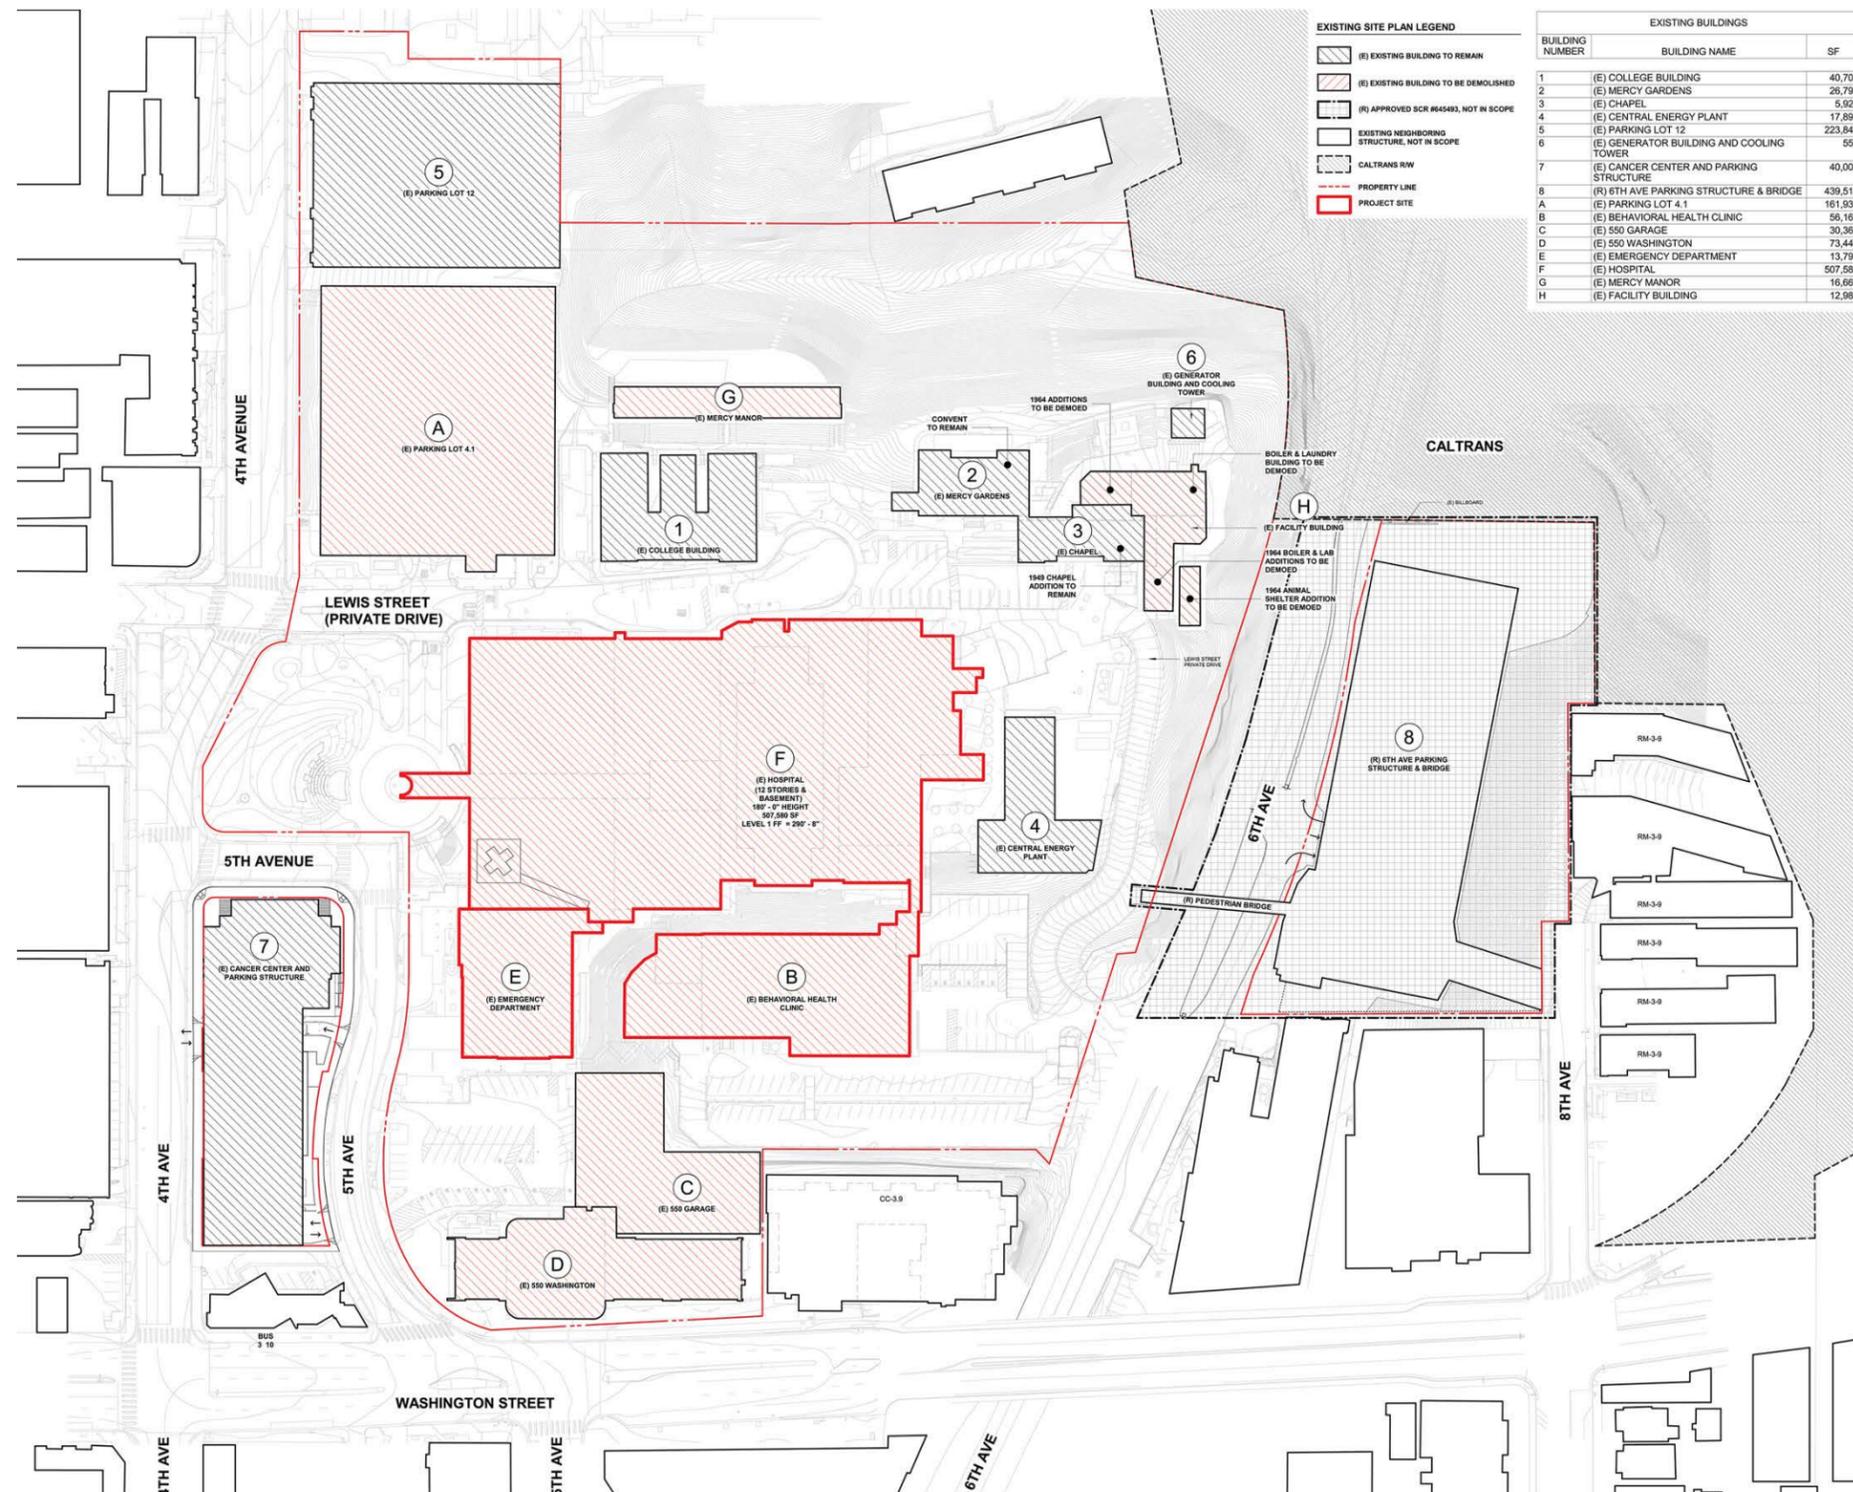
Existing Site Plan with Buildings Proposed to be Demolished, to Remain, and Areas Previously Approved
